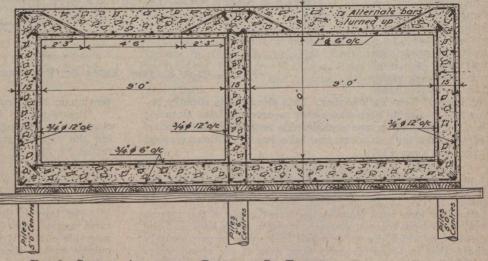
SECTION ADOPTED FOR BATHURST ST. EXTENSION THROUGH FILL
